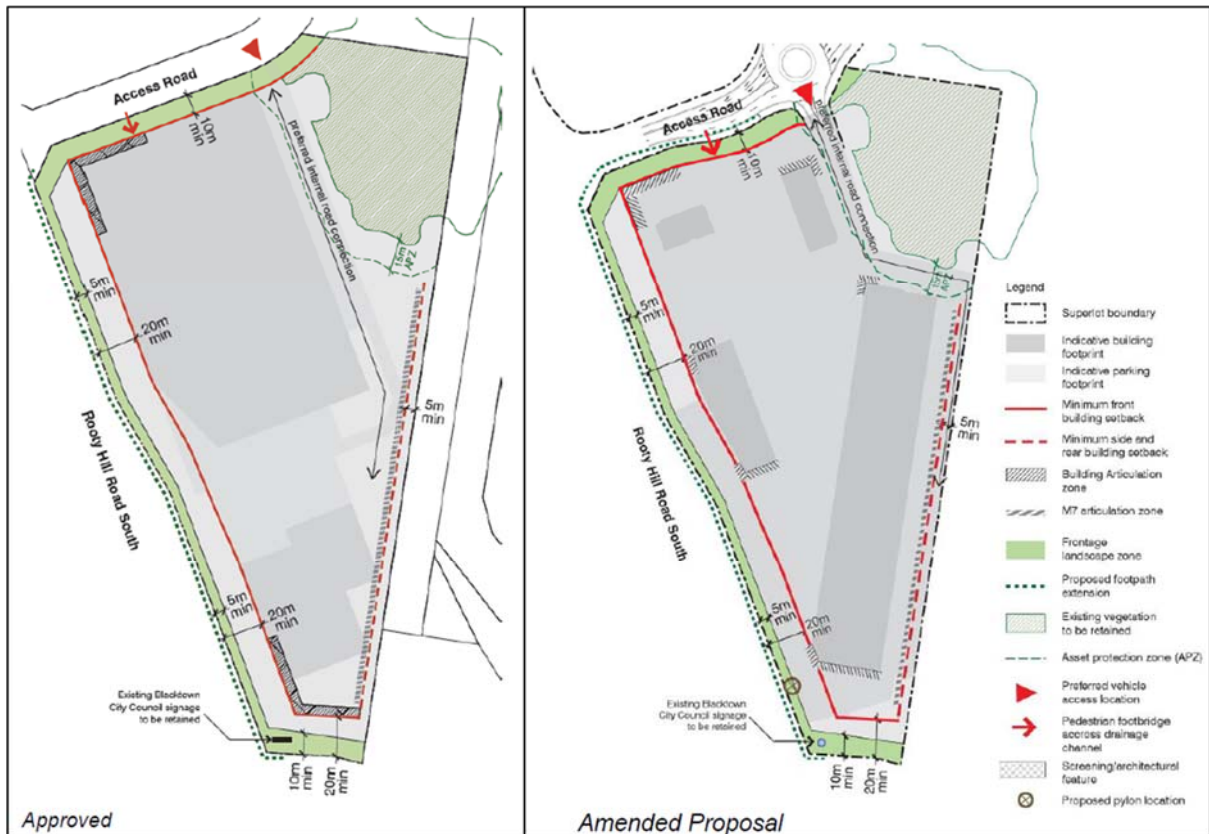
| Approved concept plan for Lot 1 (left) and proposed (right)
